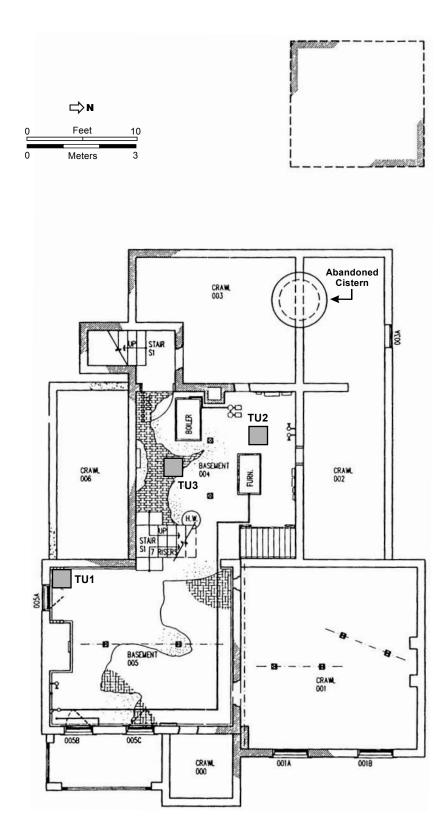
Basement floor plan of the Harriet Dean House and location of excavation units.
